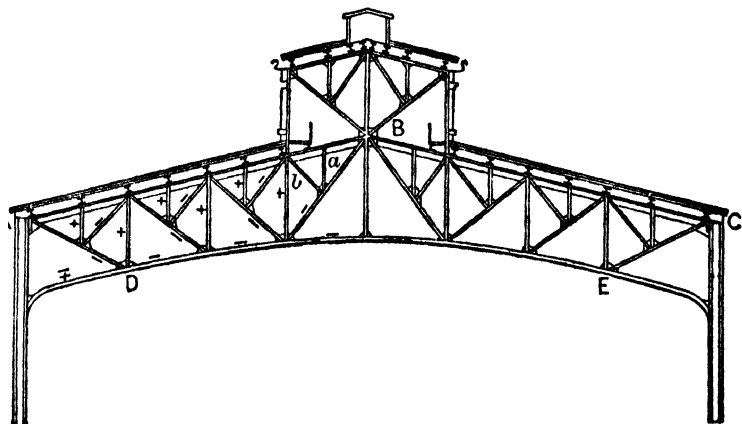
Quadrangular Truss. Span One Hundred Feet
